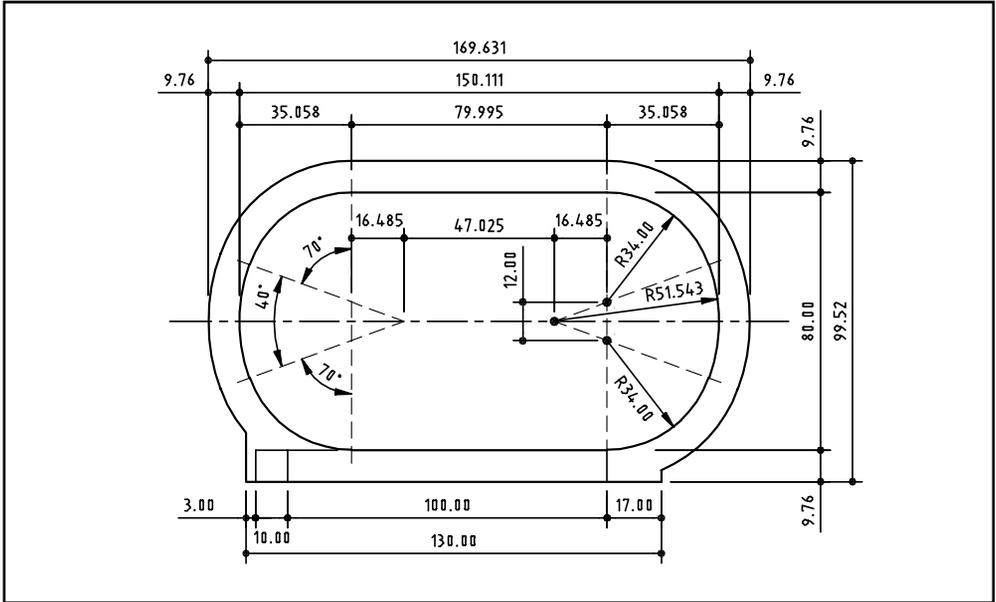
Shape and dimensions of 400m Double Bend Track (Radii 51.543m and 34.00m)
